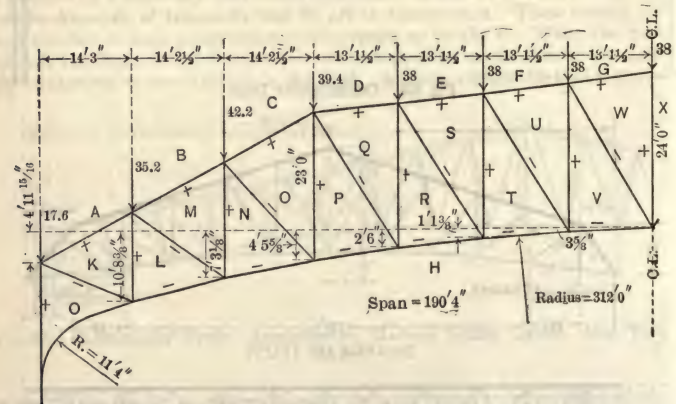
Pin-connected Truss Over Drill-hall, 71st Regiment Armory, New York City
